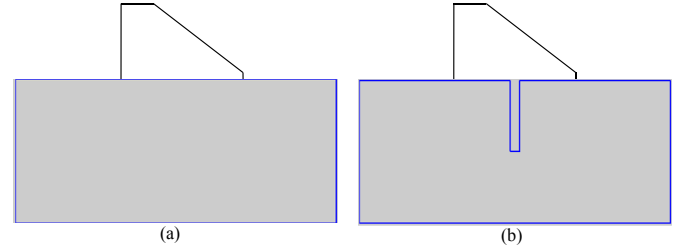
(a) Domain of dam foundation without cutoff wall (b) with cutoff wall.
